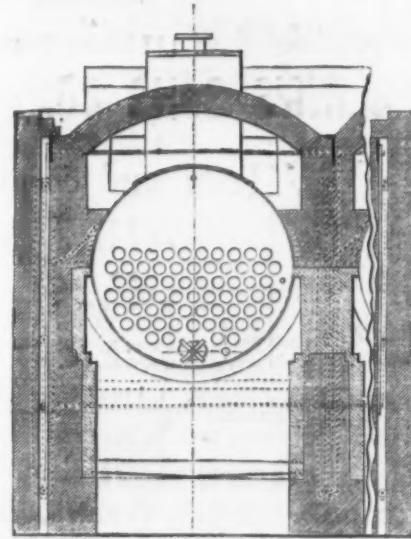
Cross Section of Brickwork through Center of Furnace, giving Section of Flues, and showing Front End of Boiler.
